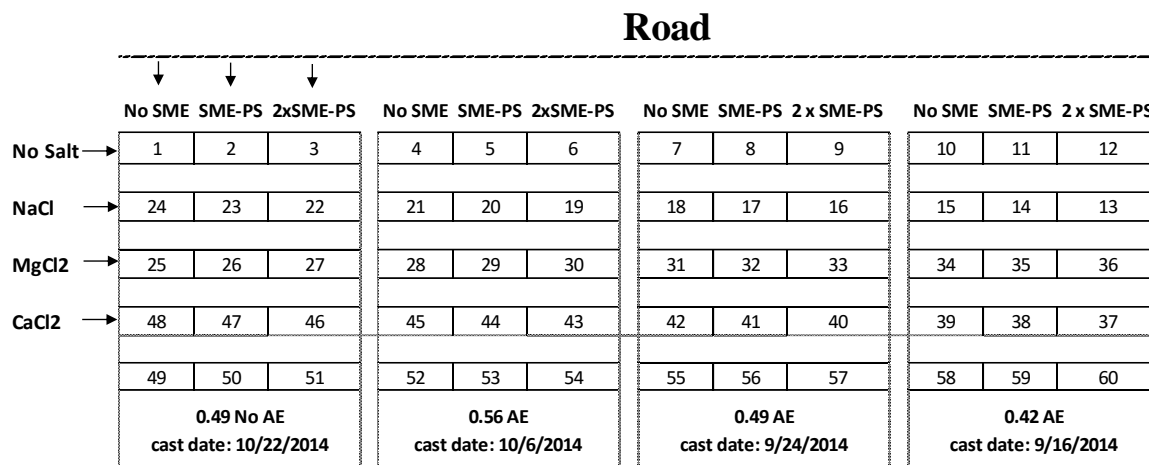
General Site Layout of the Exposure Site at CAI (1)
